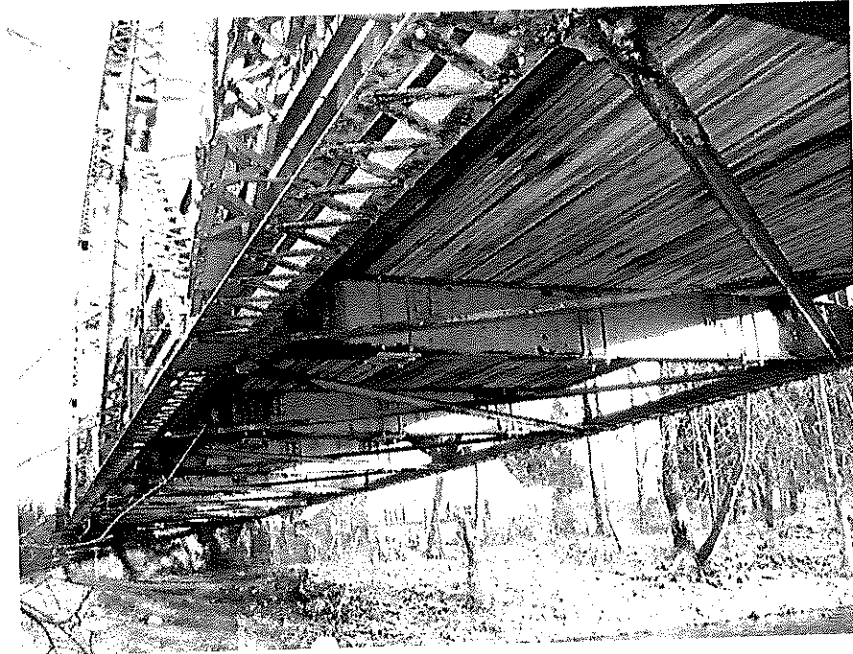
Oblique View from Northeast to Southwest below the Deck of the Collingwood Street Bridge showing Heavy Corrosion of Supporting Members
